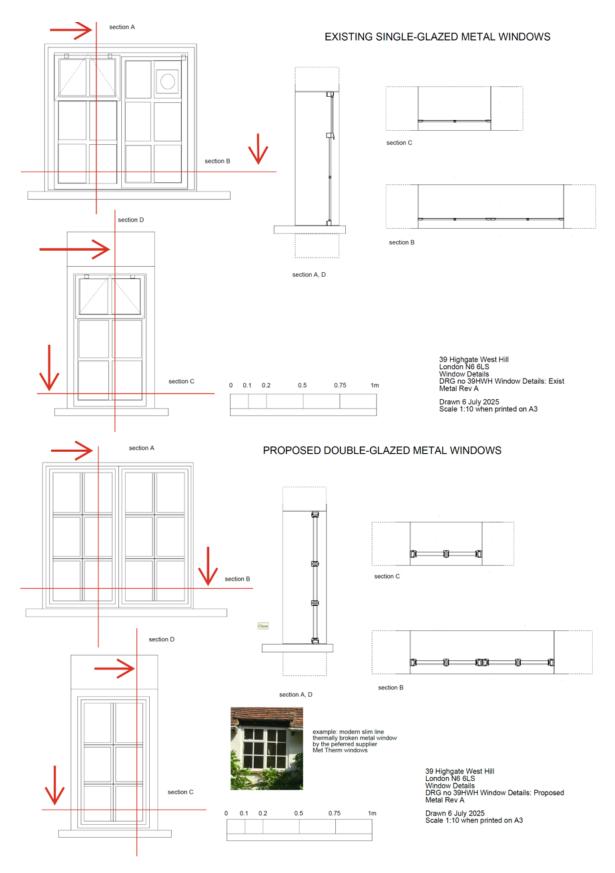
Existing and proposed window section of the metal windows on the northeast side elevation and the northwest rear elevation (Source: submitted documents)
